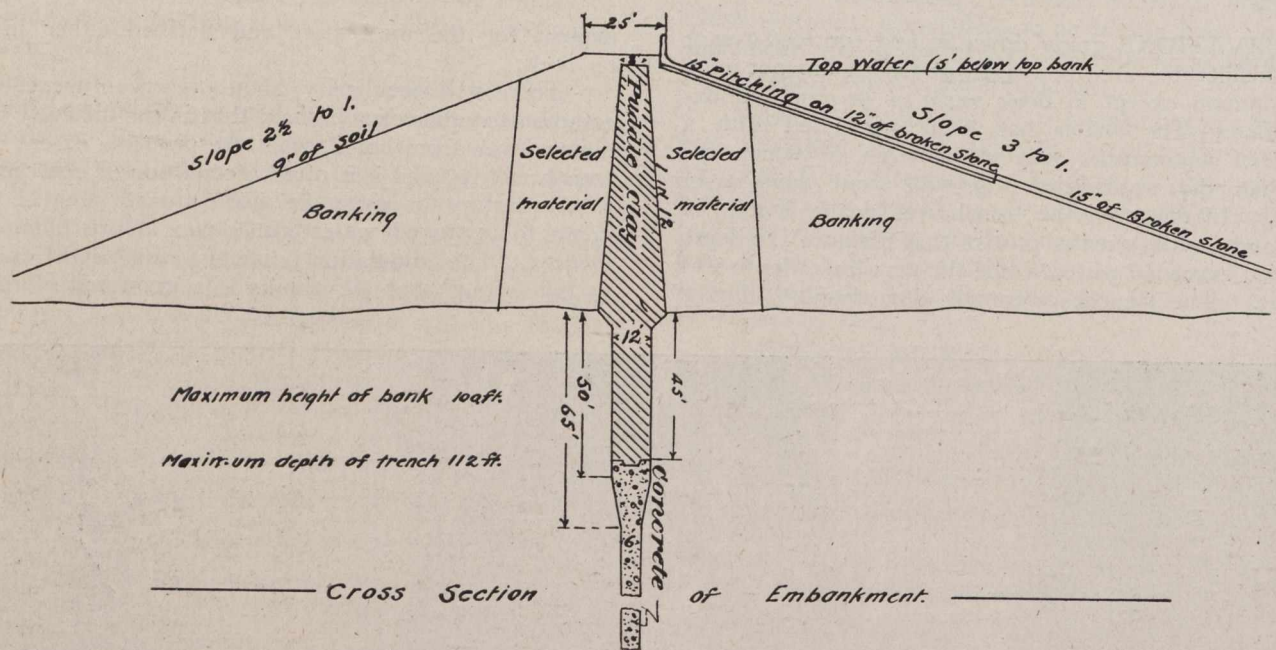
Cross-section of a Reservoir Embankment, Showing Core Wall of Concrete and Puddle Clay.
